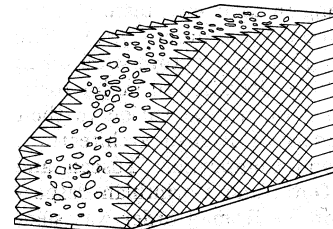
DRAWING SHOWING OPUS RETICULATUM TYPE OF WALL CONSTRUCTION
